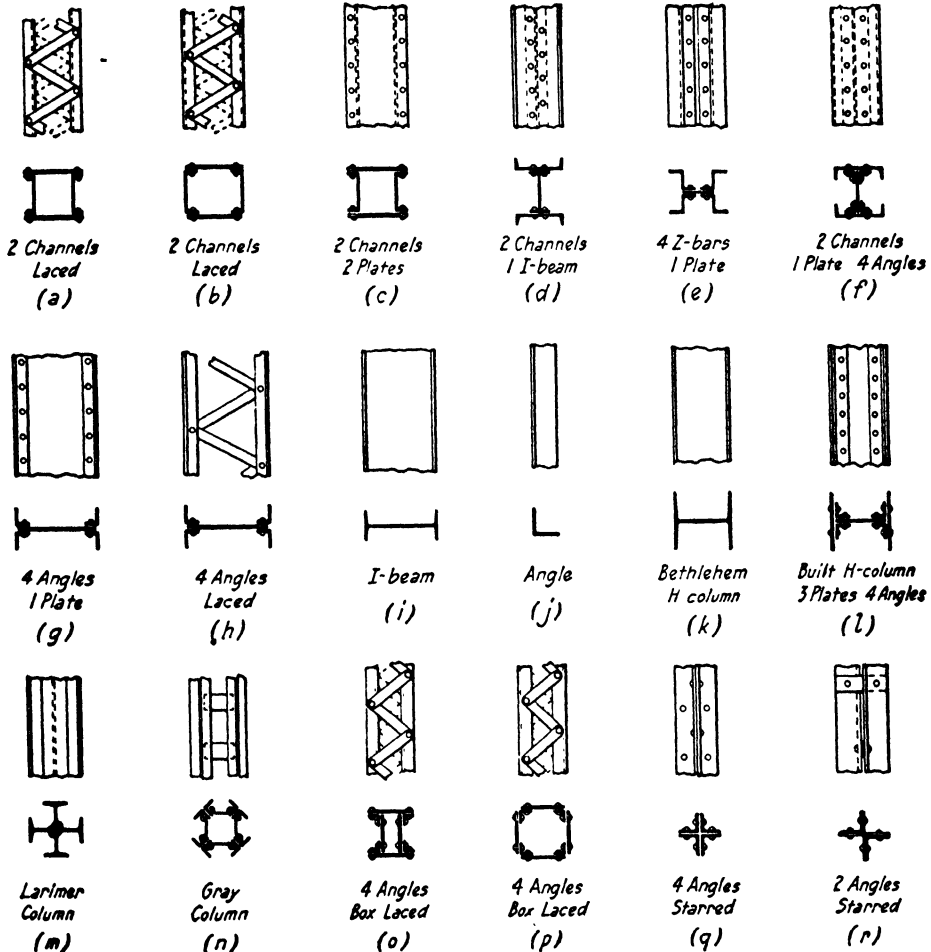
TYPES OF COLUMNS FOR STEEL MILL BUILDINGS.
